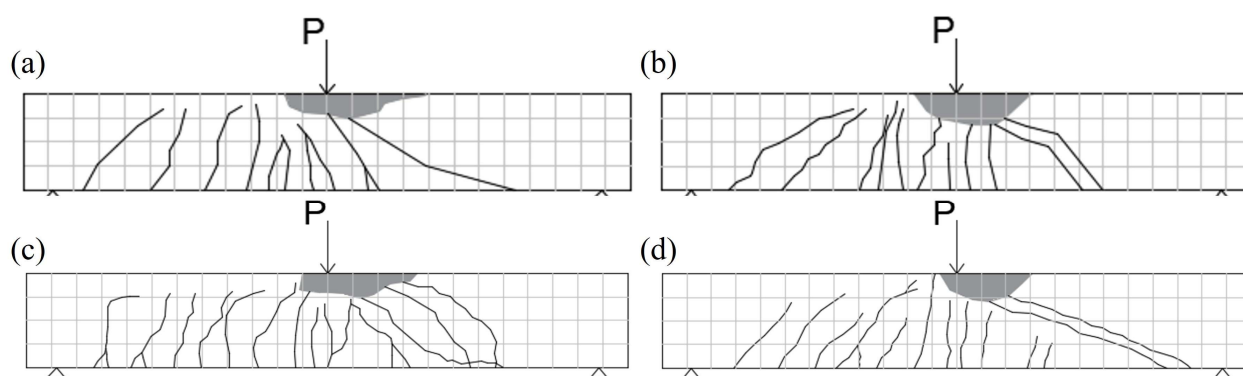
Crack patterns of the tested beams at failure. (a) Beam B1, (b) Beam B2, (c) Beam B3, and (d) Beam B4.
